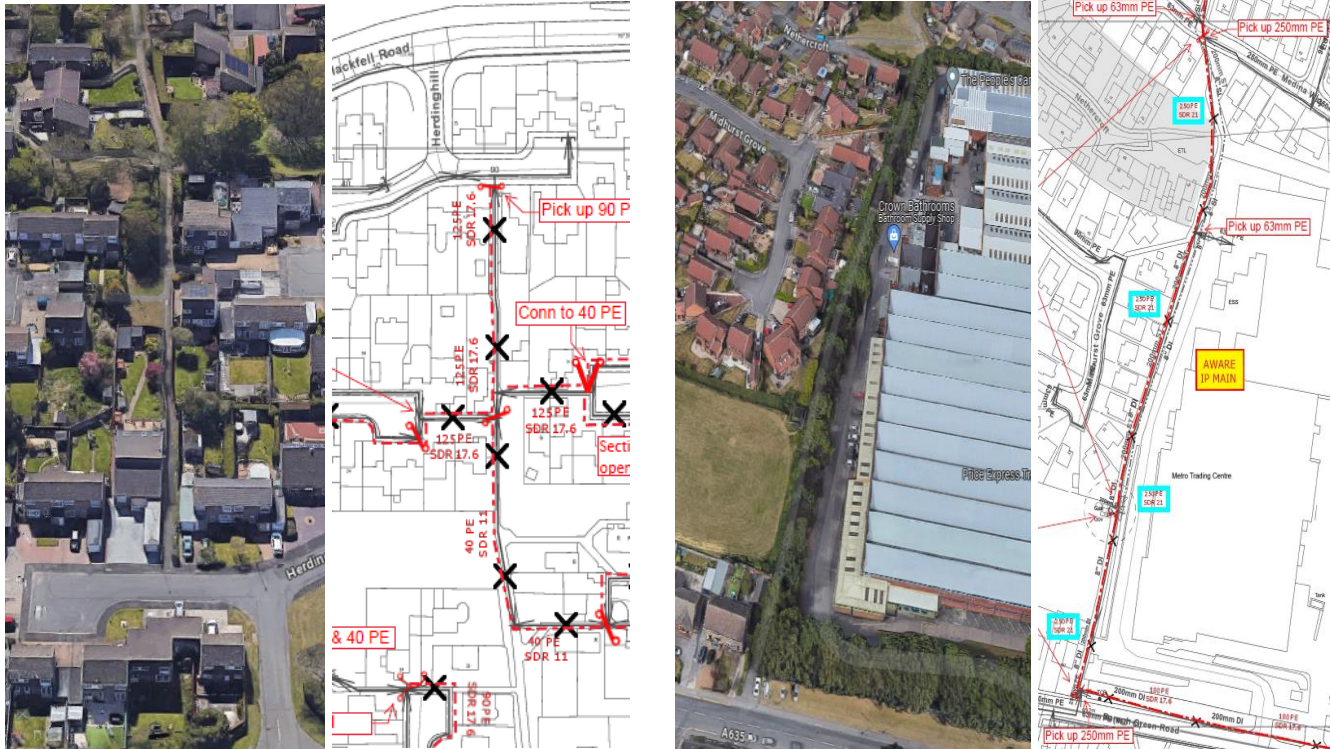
Examples of Narrow Access works – Project R1/700165 Westernmoor Washington – Tees Area and Project R1/700905 Barugh Green Road Thurnscoe – Central Area
